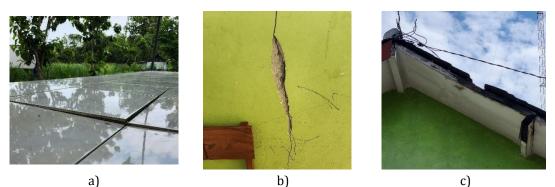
a) Cracked floor, b) Cracked wall, c) Losing roof tiles
